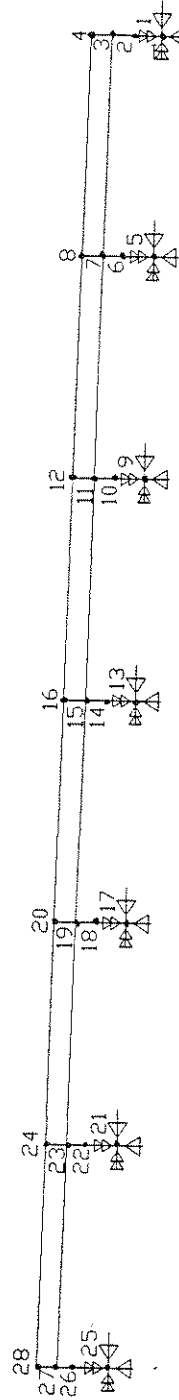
Frame-Type Model for Deck and Girder at Abutment
